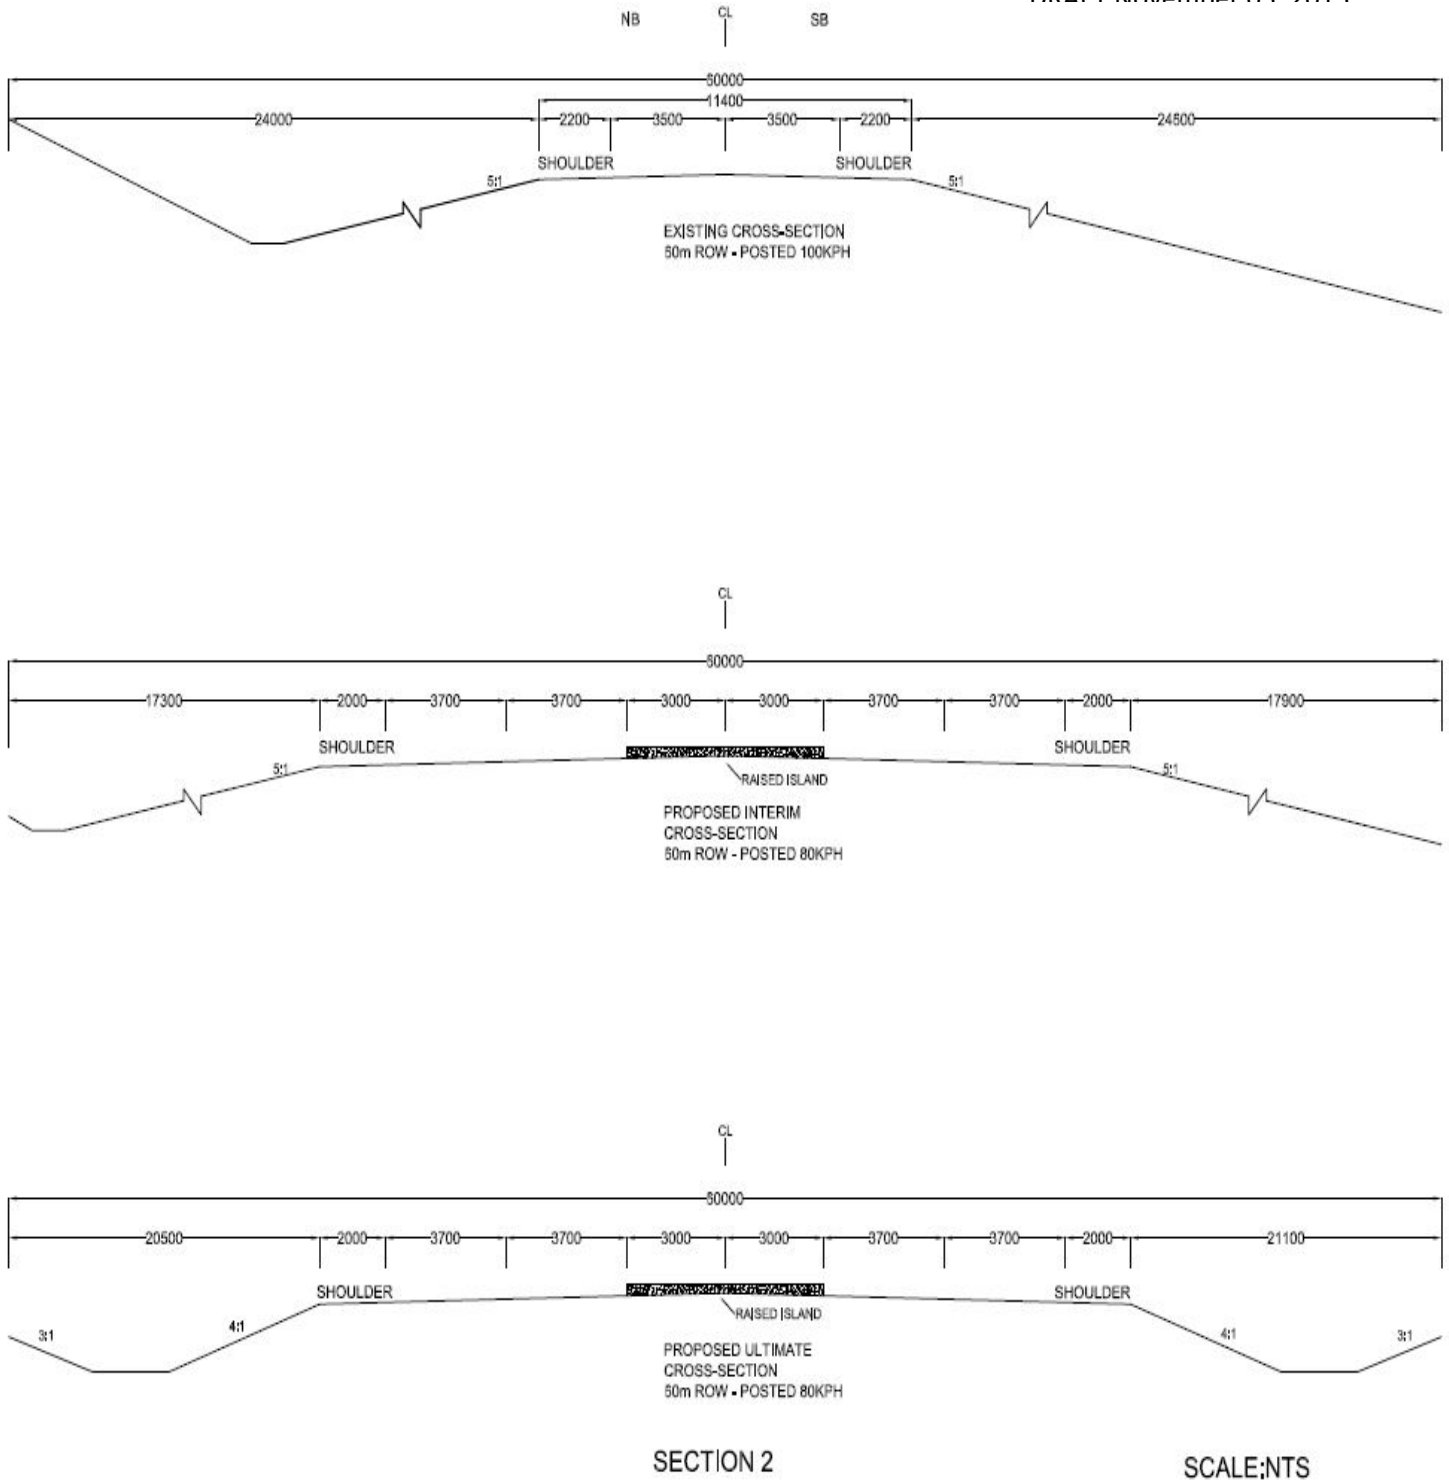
Proposed Section 2 – Hwy 7 South of RR 23
